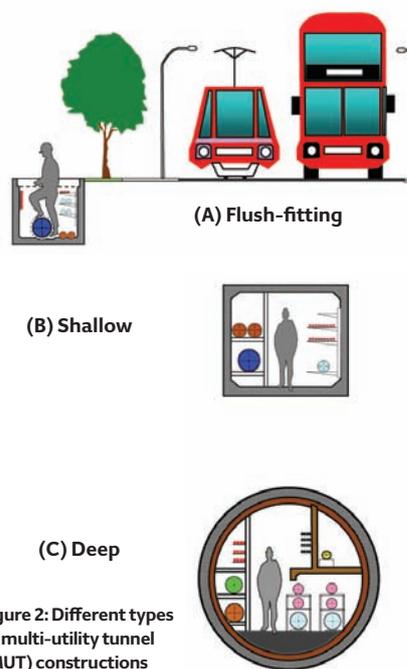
Different types of multi-utility tunnel (MUT) constructions
